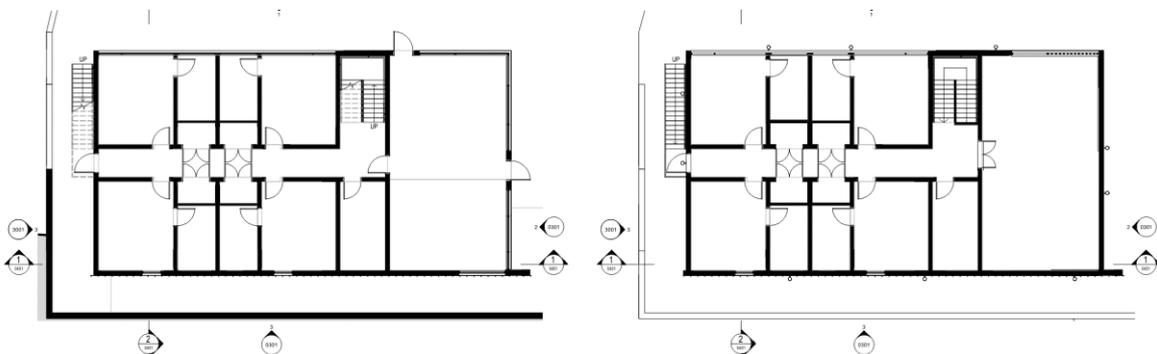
Proposed police accommodation layouts for Ground Floor (left) and Level 1 (right).
